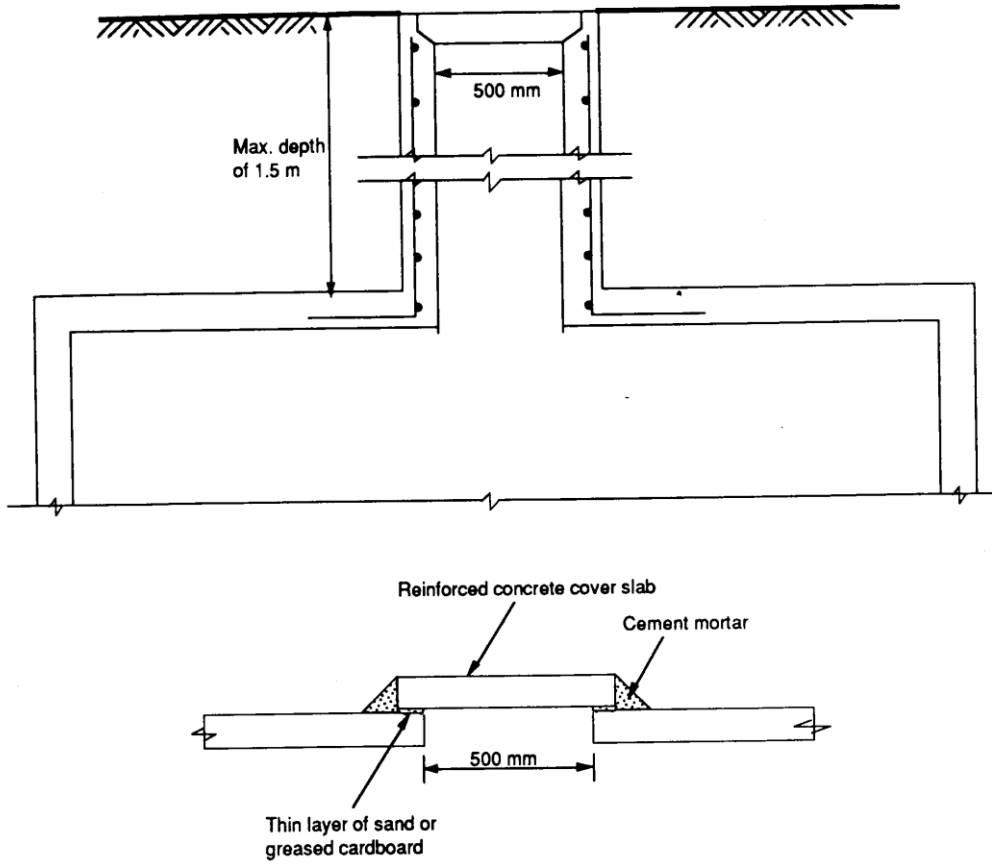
C TWO ALTERNATIVE METHODS OF PROVIDING MANHOLE COVERS
